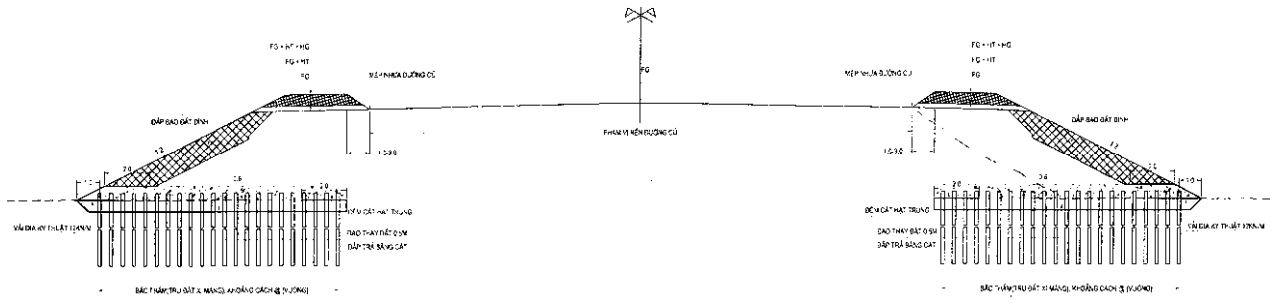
Layout of Prefabricated Vertical Drain (PVD)
